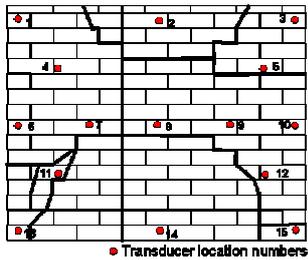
(c). Crack pattern and deflection at centre for hollow block wall (3.8m x 3m) supported on all 4 sides – repeat test
